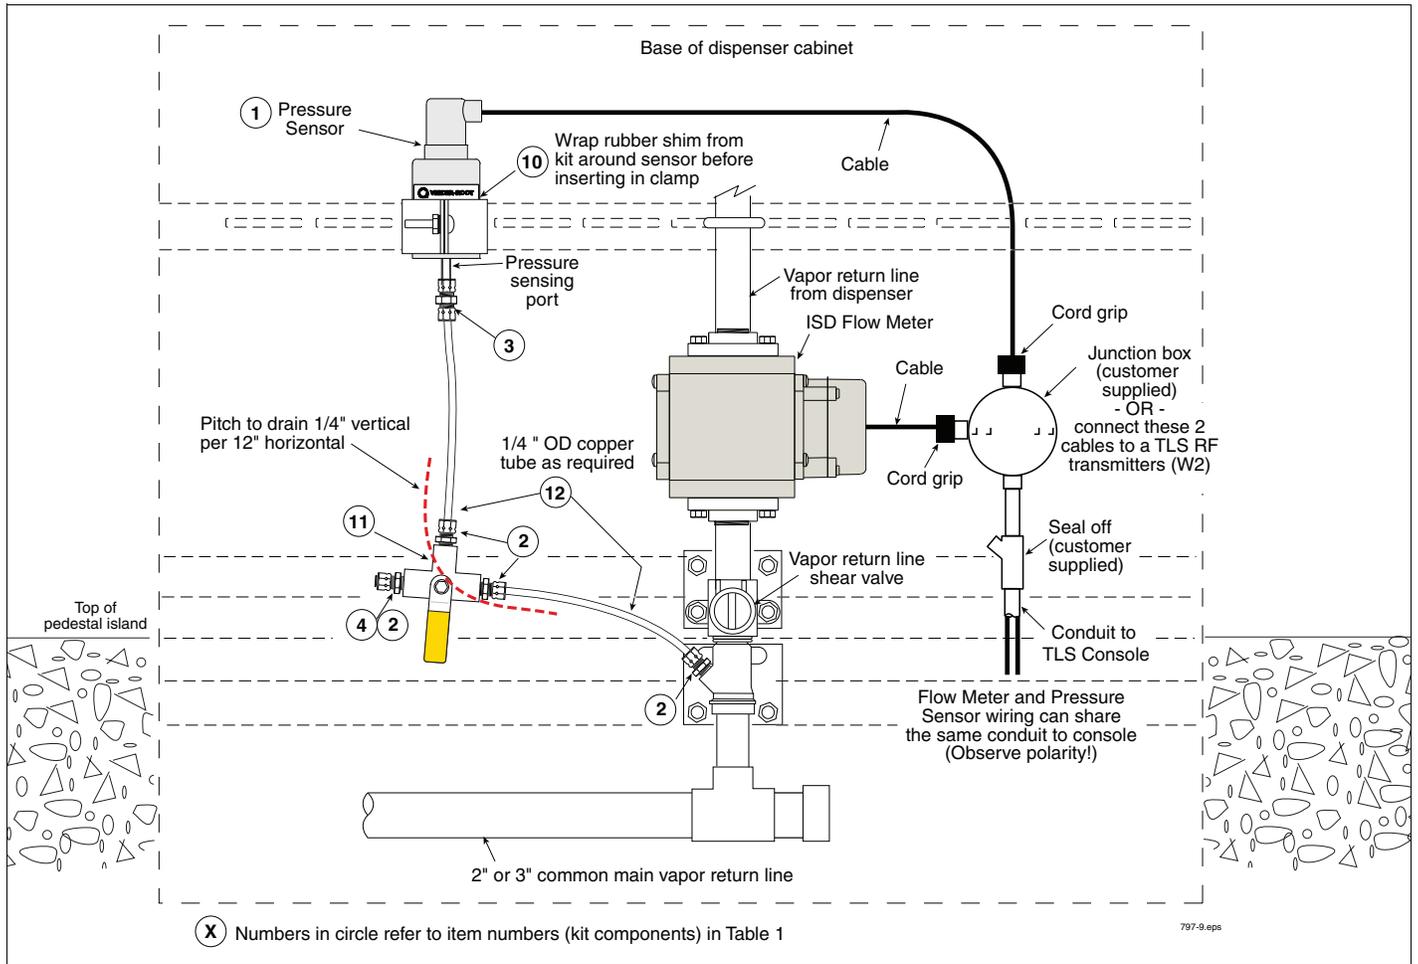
Example Pressure Sensor Install In Shear Valve Port - Preferred ISD Installation (With Vapor Flow Meter Above Shear Valve)
